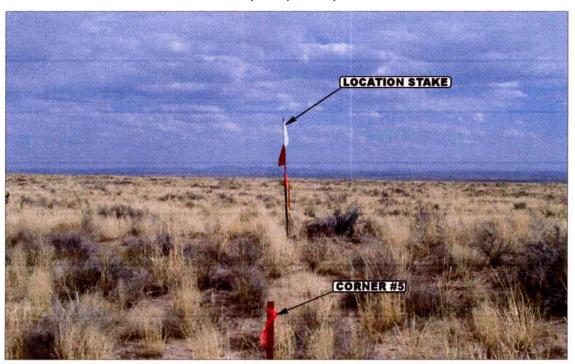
PHOTO: VIEW FROM CORNER #5 TO LOCATION STAKE
